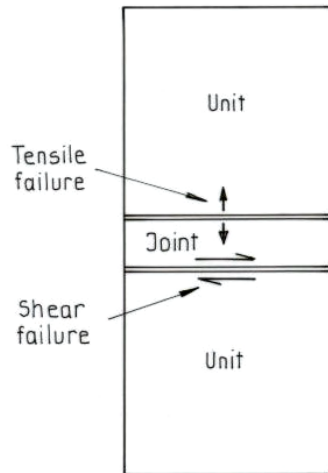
Detail of the joint brick boundary, with spring elements modelling tensile failure and contact elements modelling shear failure in two different layers.
